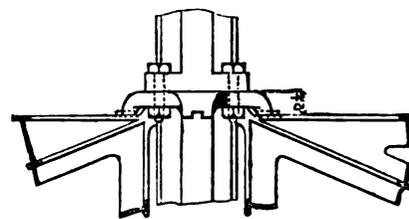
Elevation of Upper Portion of Connecting Piece, &c.
